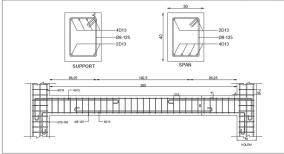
Cross-Section and Longitudinal Section Details of the Main Beam
